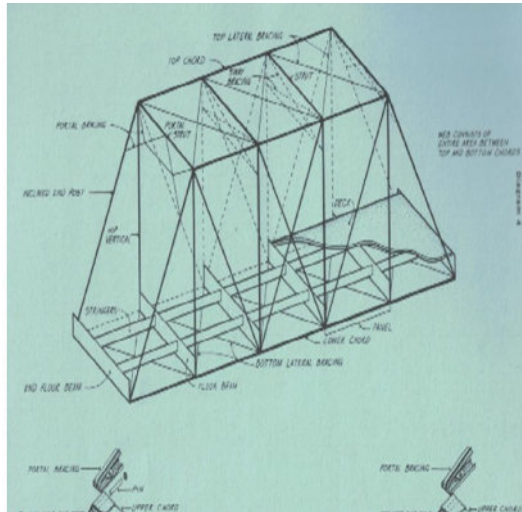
Pratt Truss Bridge (from Comp and Jackson 1977)
